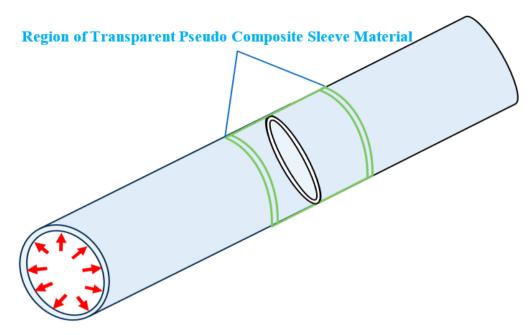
Schematic of imaginary composite sleeve materials for possible joining or repairing of cracked pipeline.
